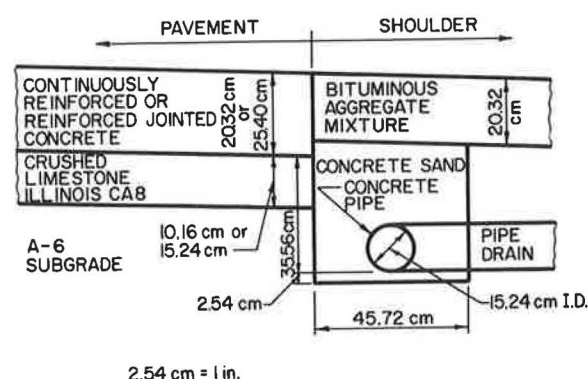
Subdrainage systems at test sections on I-57 in Illinois.
